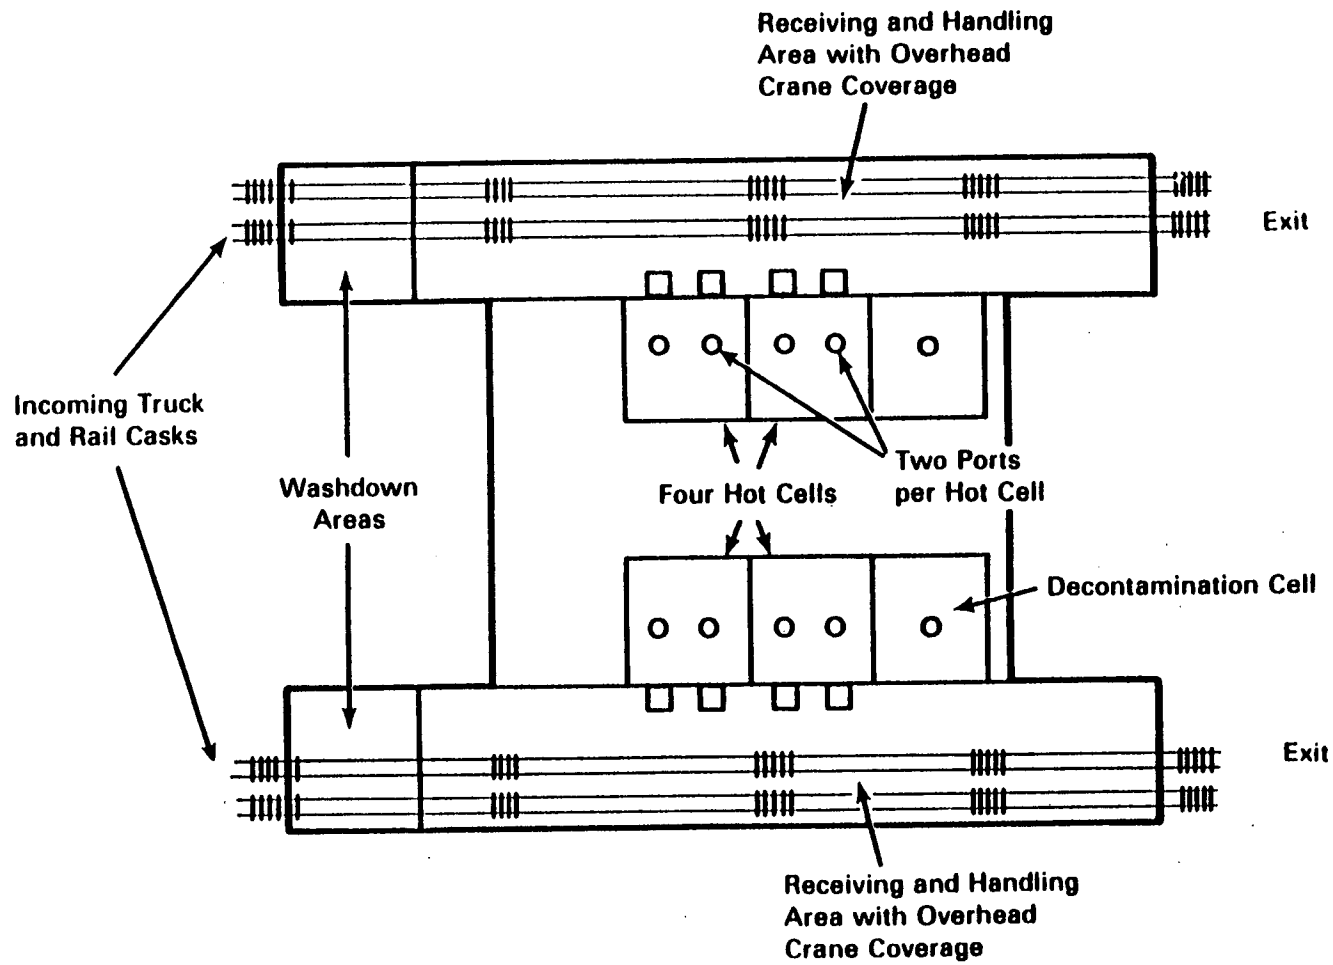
Receiving and Handling Building Layout at the Postulated Reference Repository
